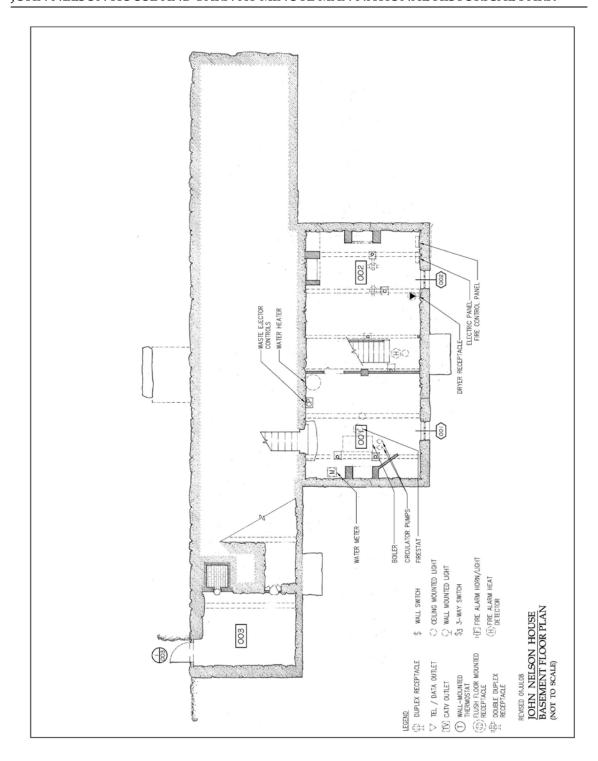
Mechanical, Electrical, and Plumbing key plan, Basement.
